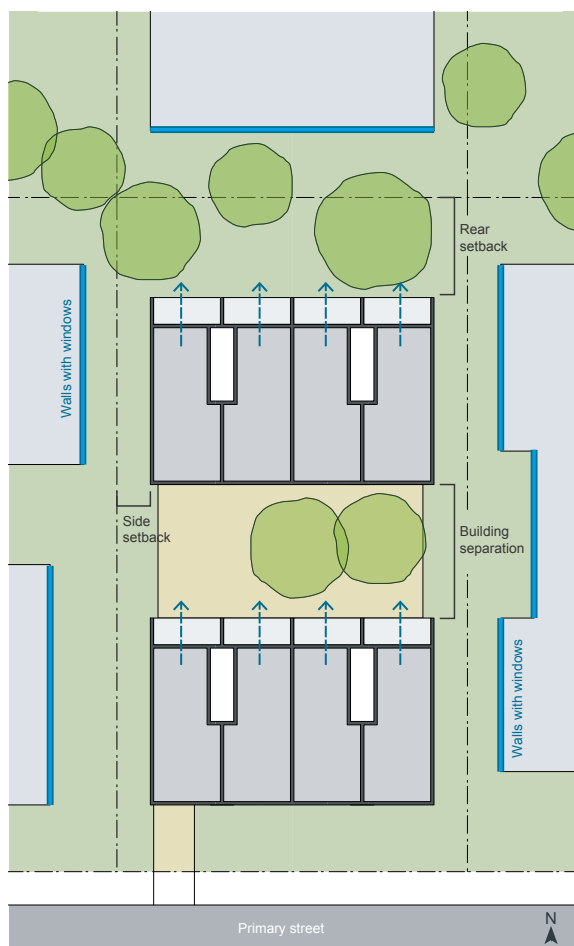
H.3 On narrow infill sites, select a building type that orientates habitable rooms to the street and rear, minimising required side setbacks
